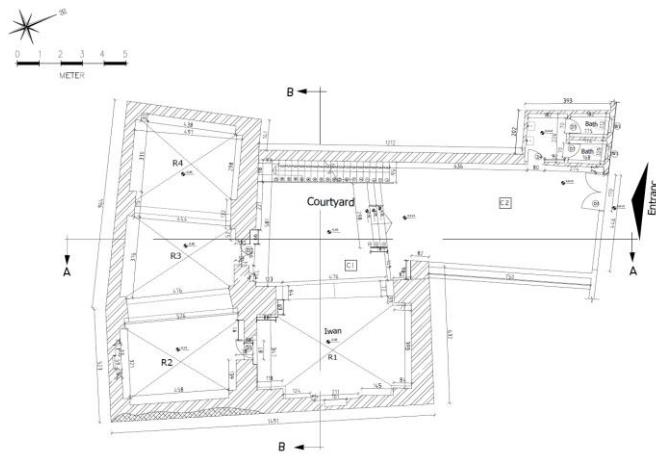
Al-Ashi house, ground floor plan. (Source: Iwan Centre, 2012)
